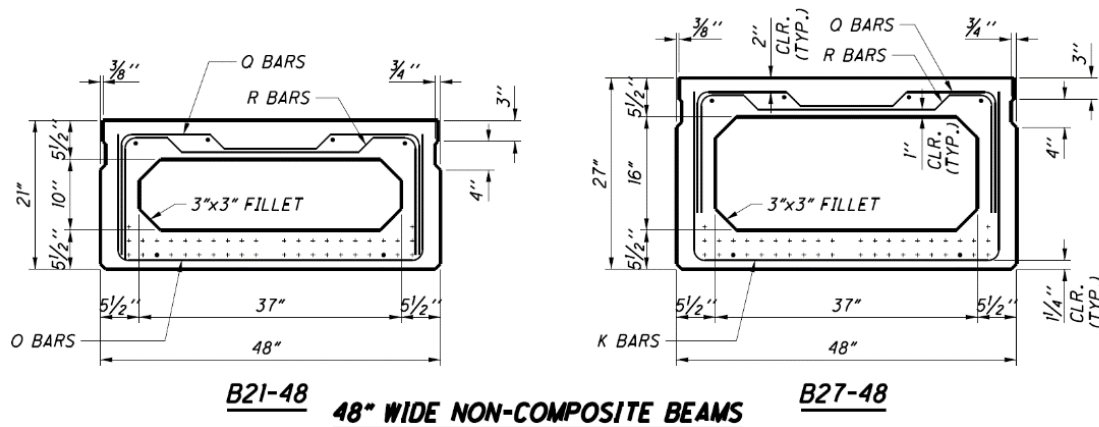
Standard Sections and Details of the Keyway Geometry
